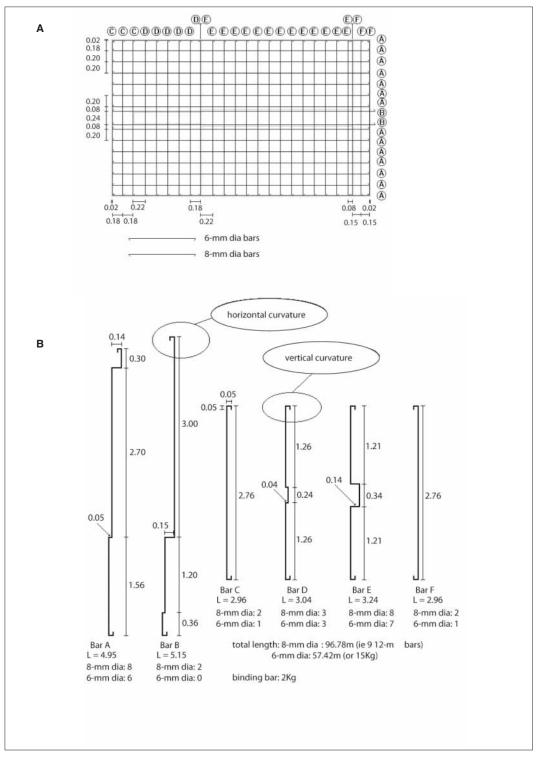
Slab reinforcement plan. A: general plan. B: diameters of the different bars
